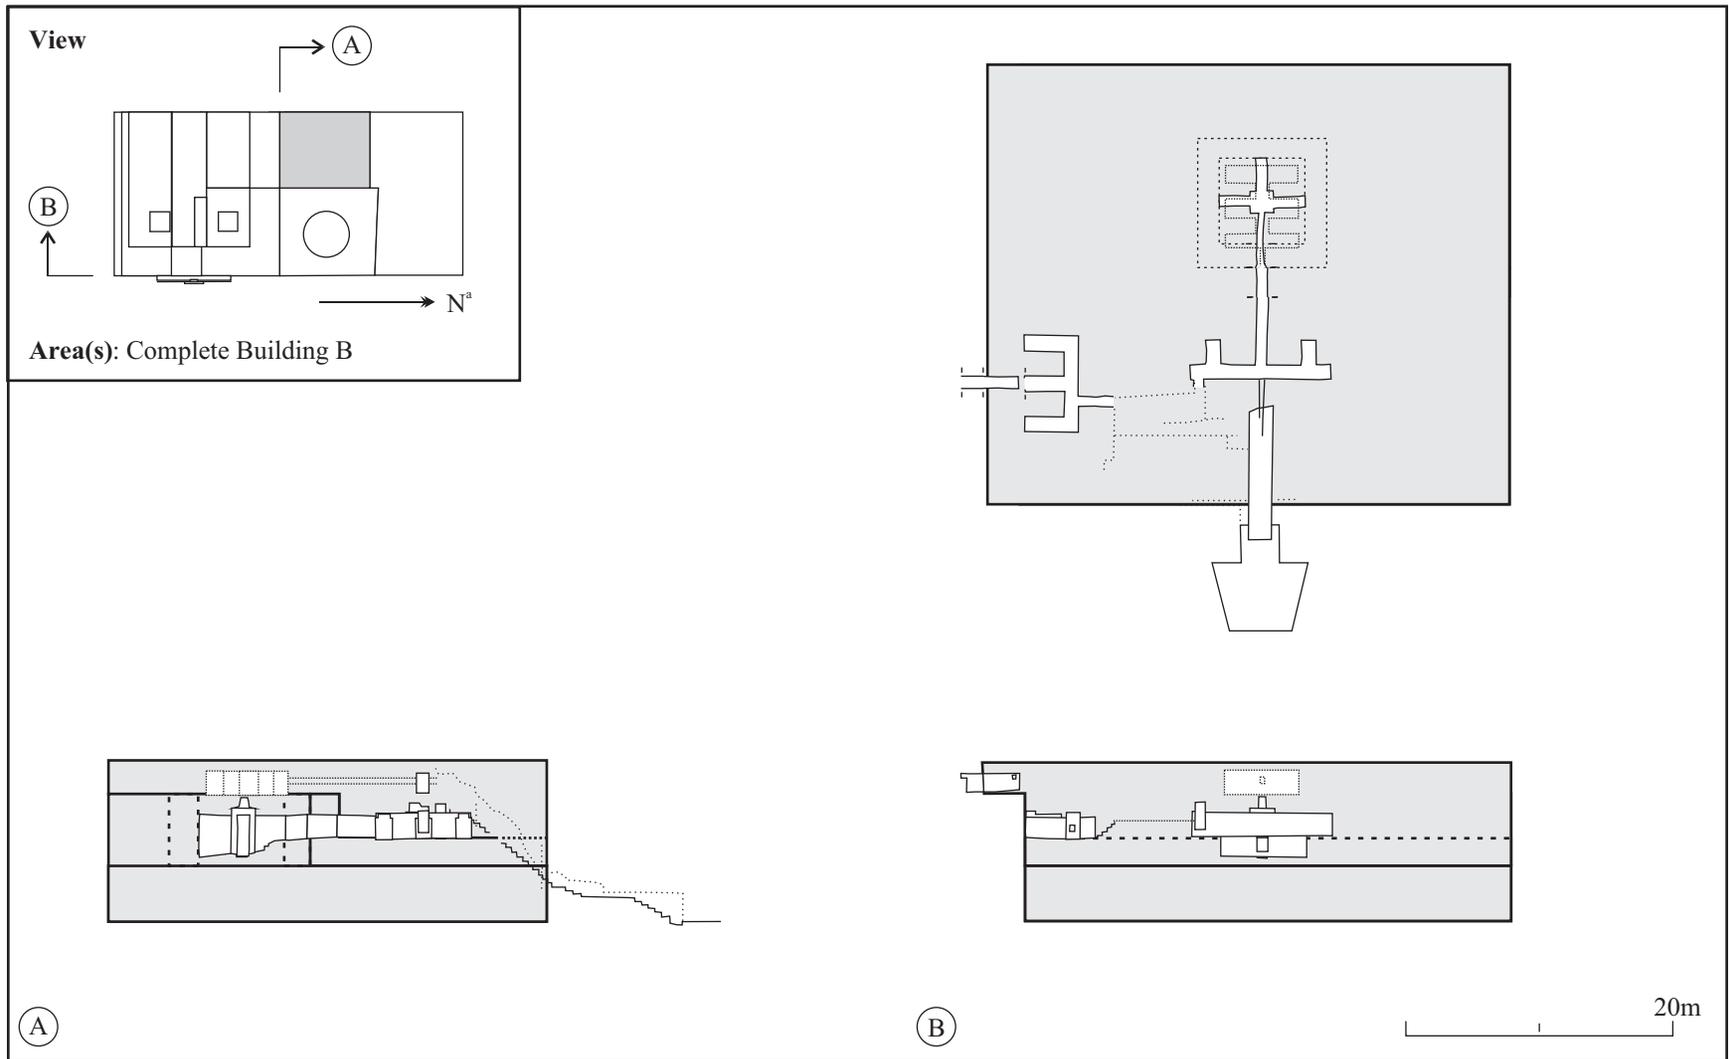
Building B Construction Phases: Full Sequence. CP Staircase not shown in view (B).
